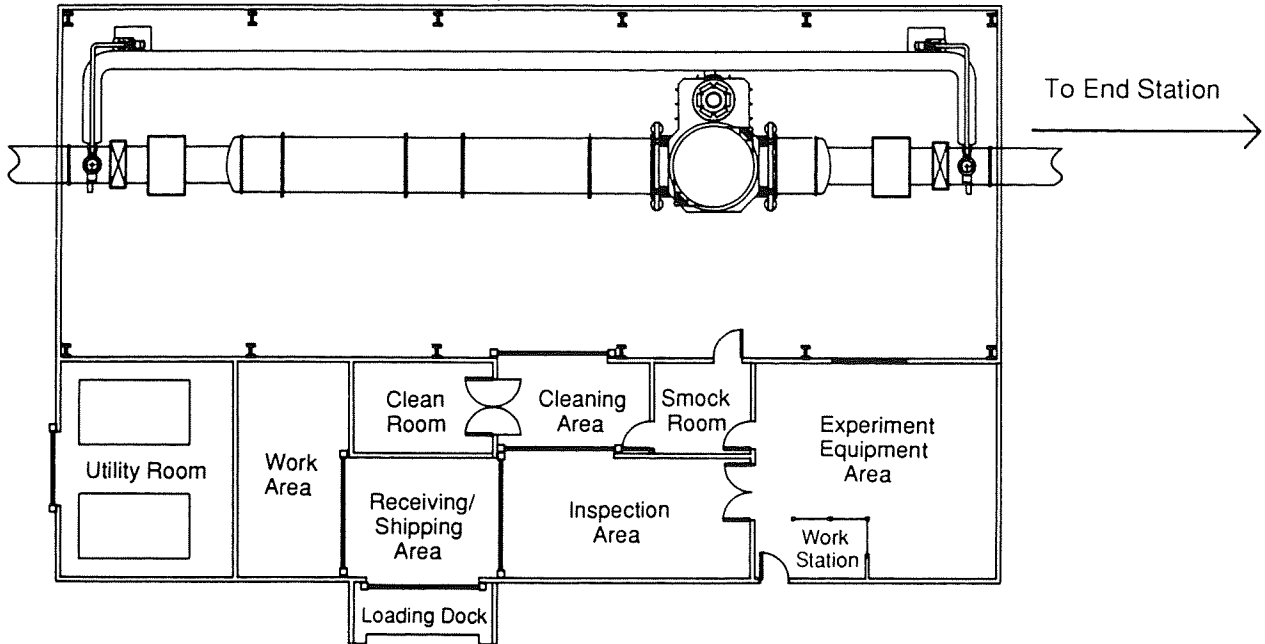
Floor plan of the right-arm mid station at Site 1. The left-arm mid station has a similar (mirror-imaged) floor plan. There are no mid stations at Site 2.
